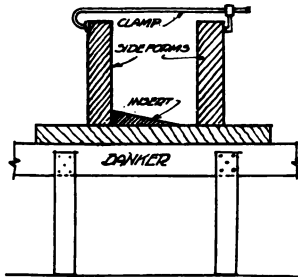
SIMPLE WOOD MOLD—SECTION VIEW
